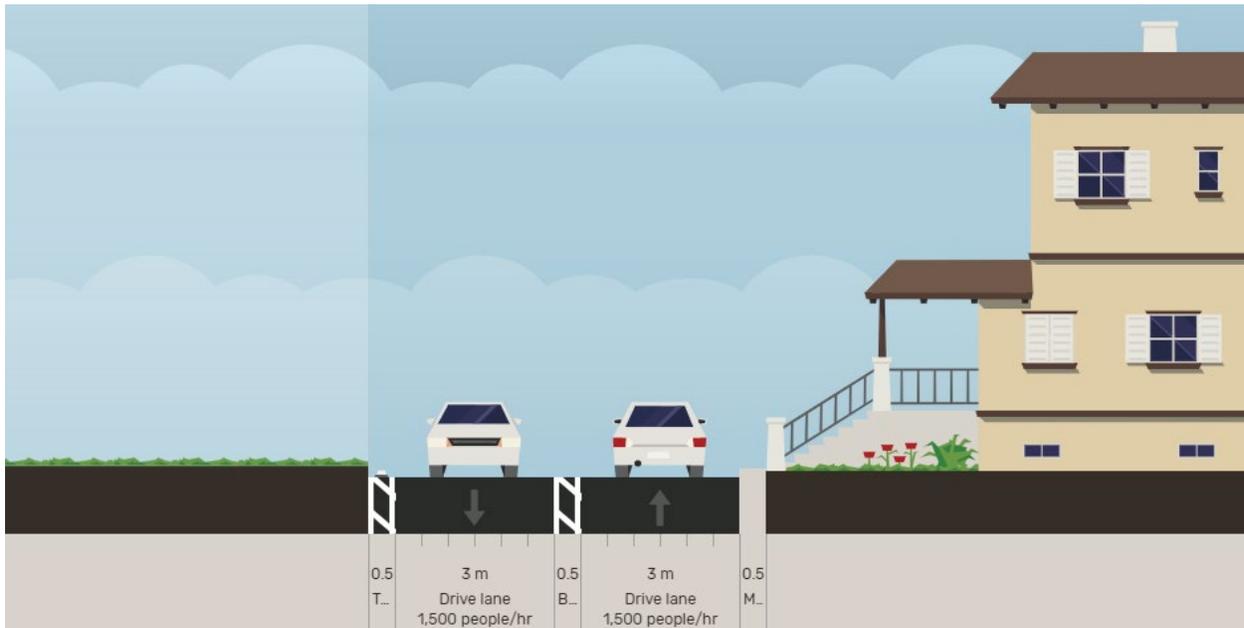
Hedge Road at Lake Drive E – Park Road
